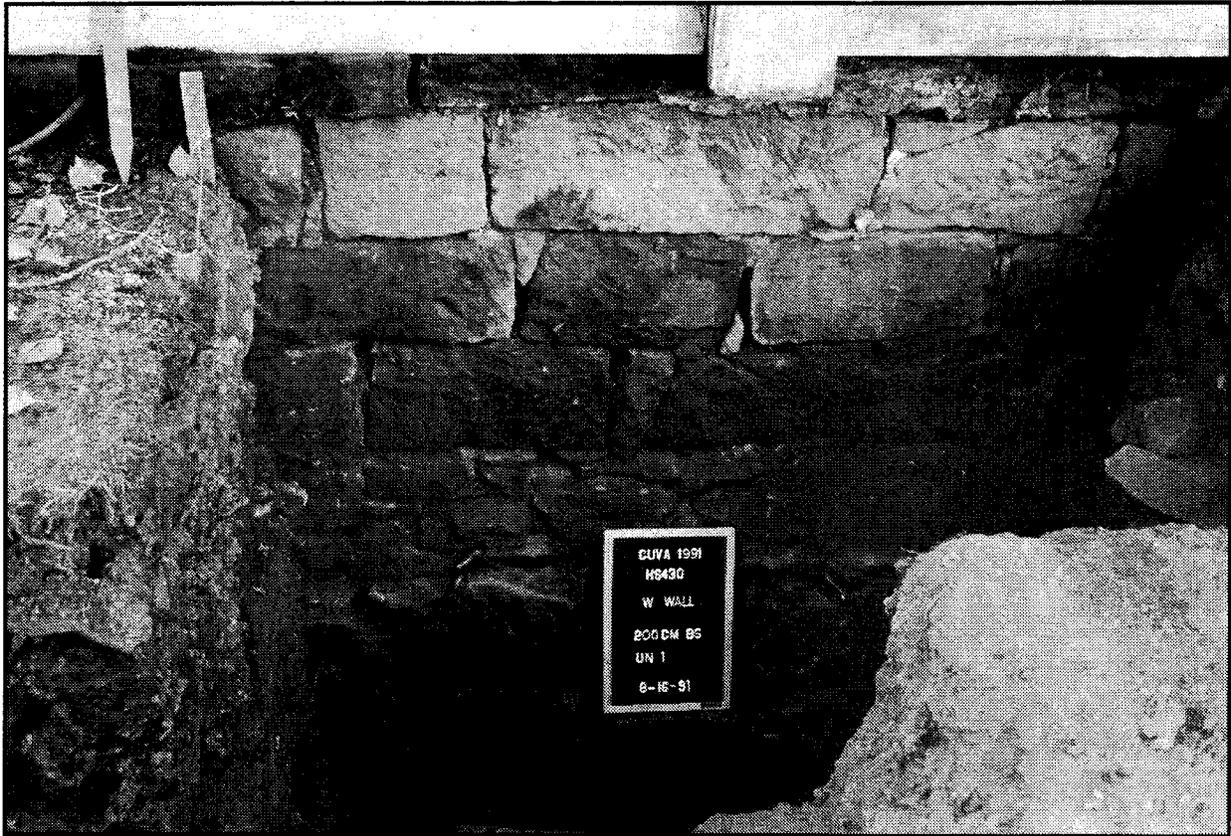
Photograph of the west wall of Unit 1, showing the outer surface of the east wall of the structure's foundation.
